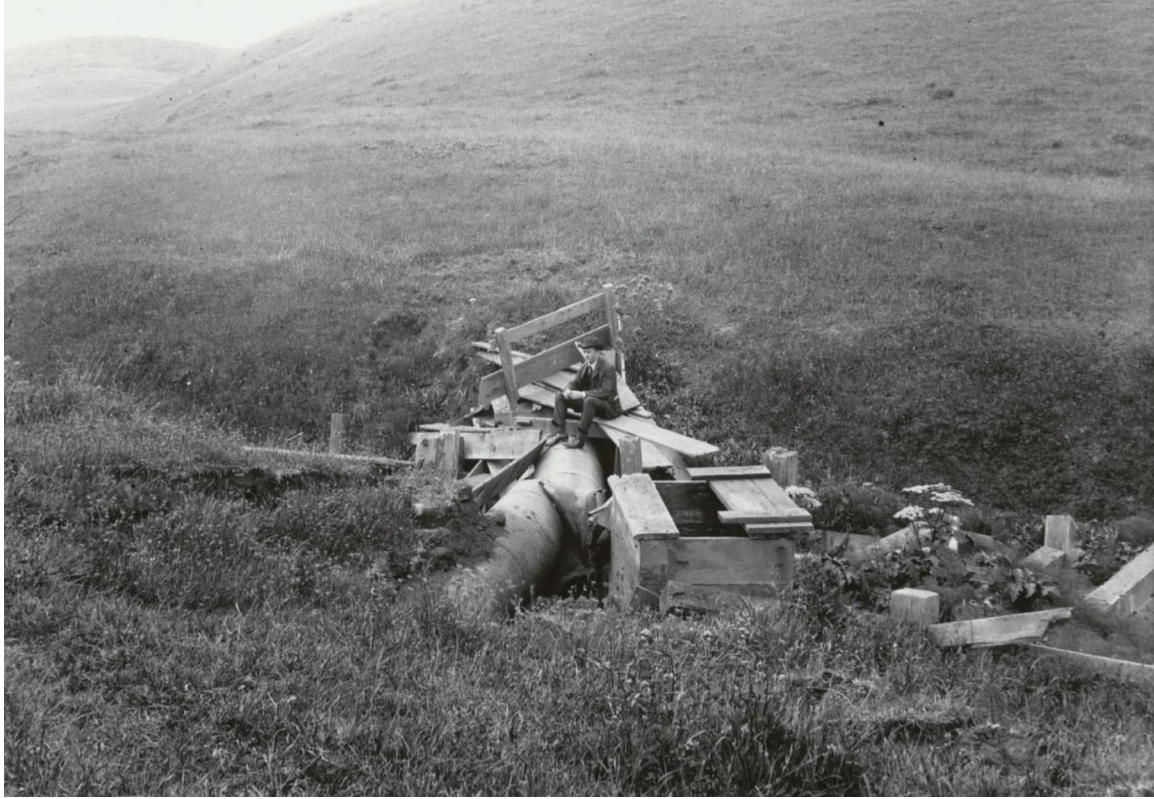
Failure of Pilarcitos 30 inch pipeline. Pipe telescoped and was thrown sideways off the wooden bridge crossing Small Frawley Canyon. View looking northeasterly. (Photo: Harry O. Wood, 1906)
